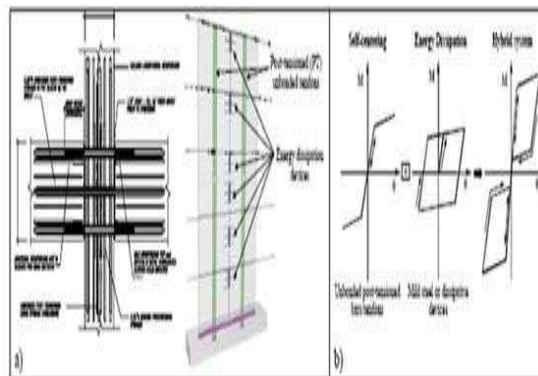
Hybrid solutions for precast concrete frame and wall system.
